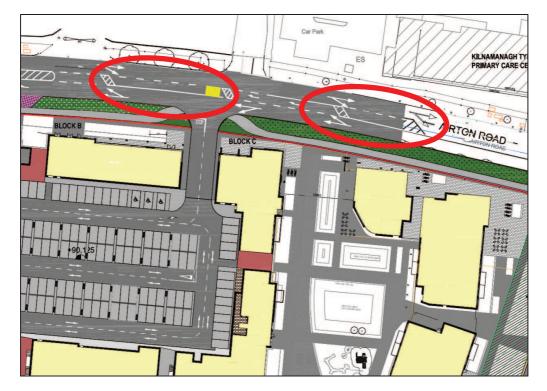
Apparent Discrepancies in Proposed Road Markings on Airton Road
